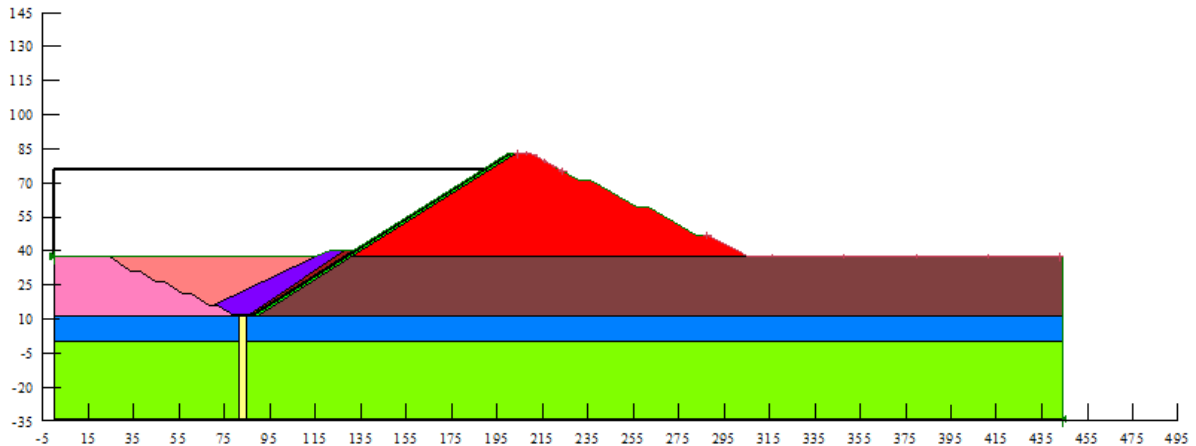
Configuration of dam at its maximum section (the thick alluvium deposit under the dam foundation and large cross-section -Chainage 0+180)
